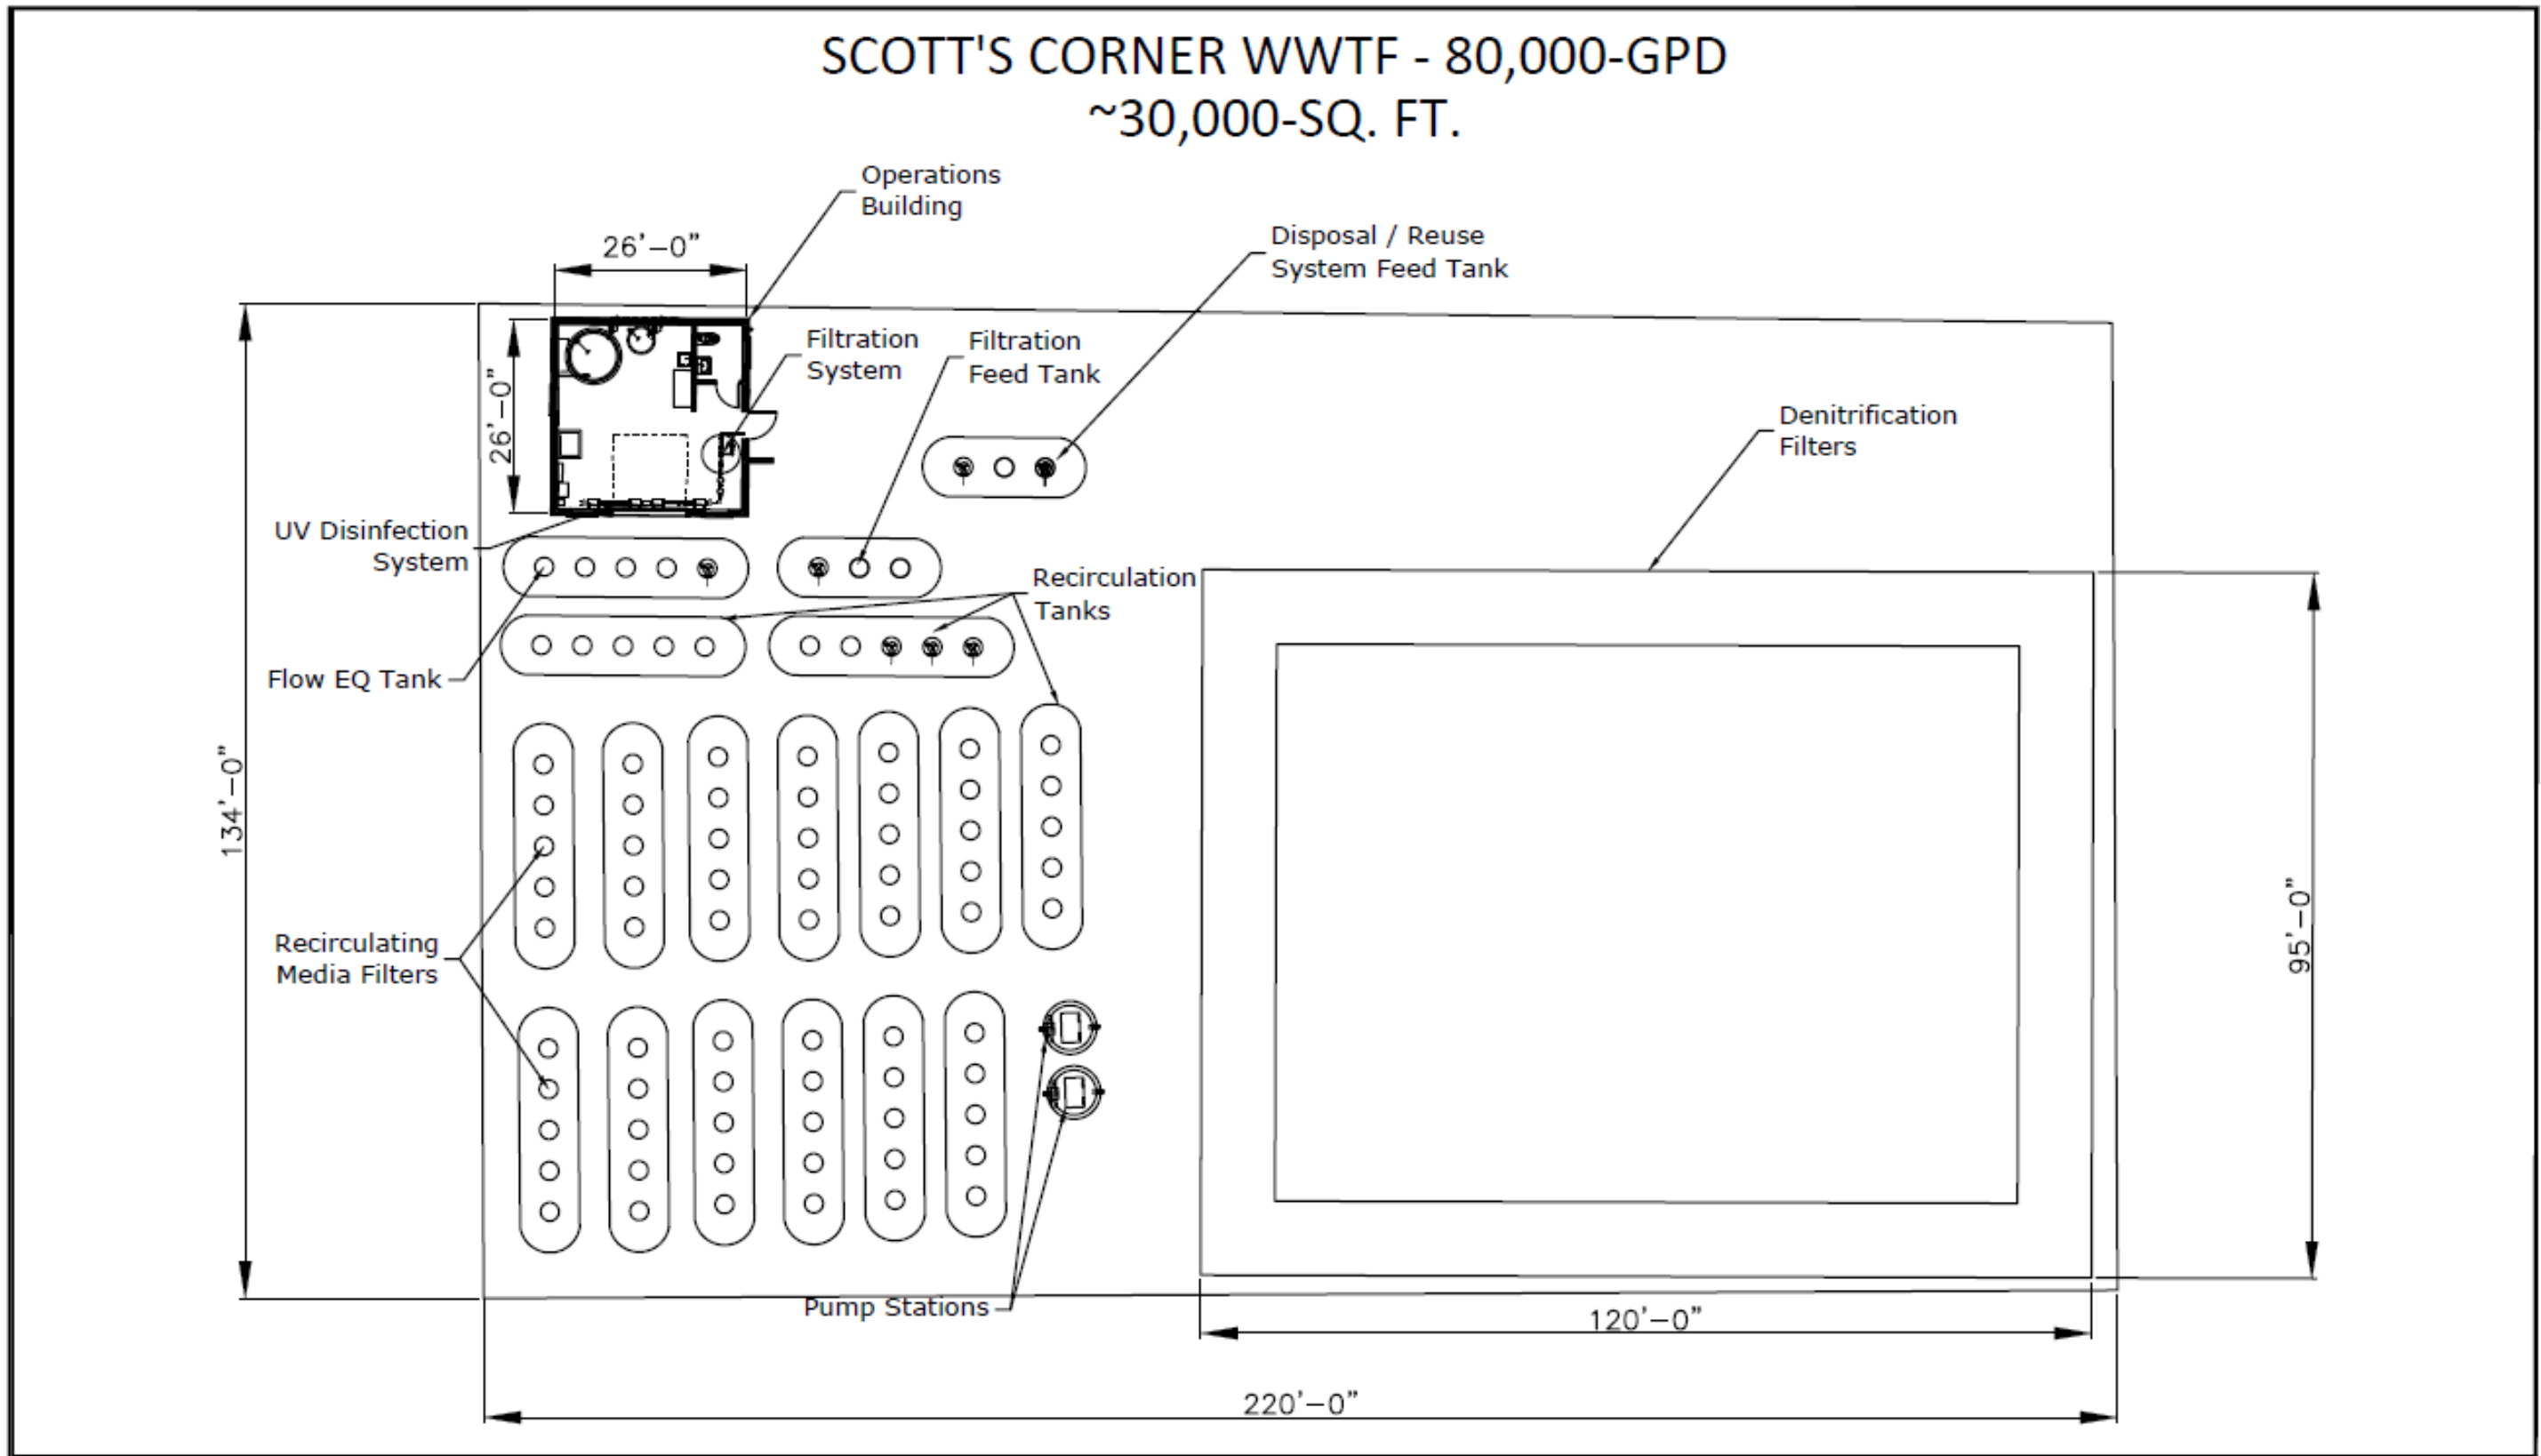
80,000-gpd Wastewater Treatment System Preliminary Layout
